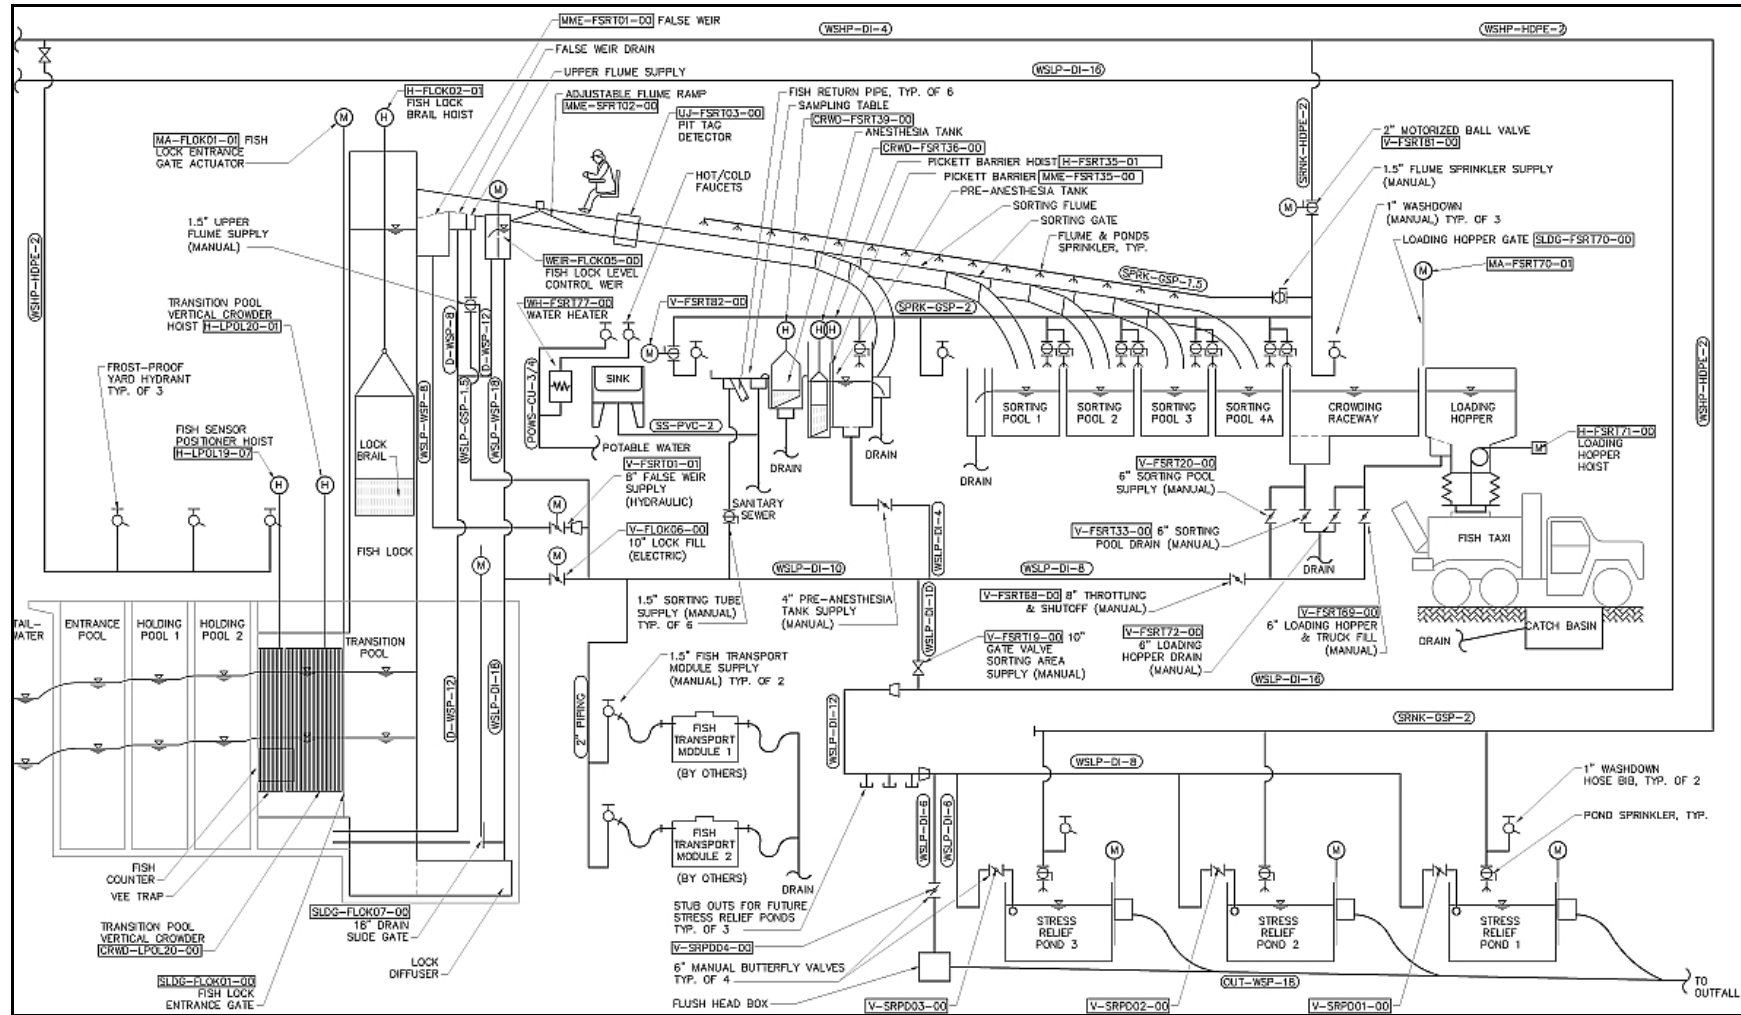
Water supply routing of Baker River AFT, Concrete, Washington.
